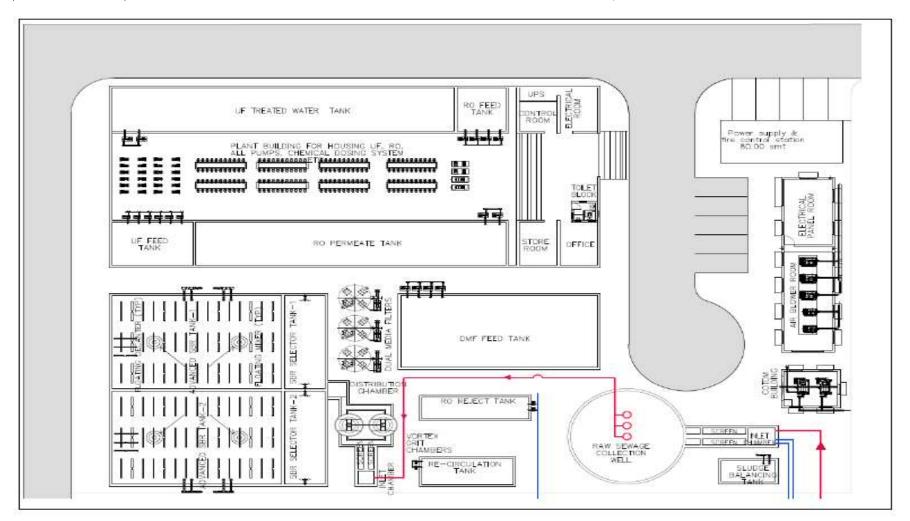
Layout Plan of Sewage Treatment Plant with ASBR Technology
